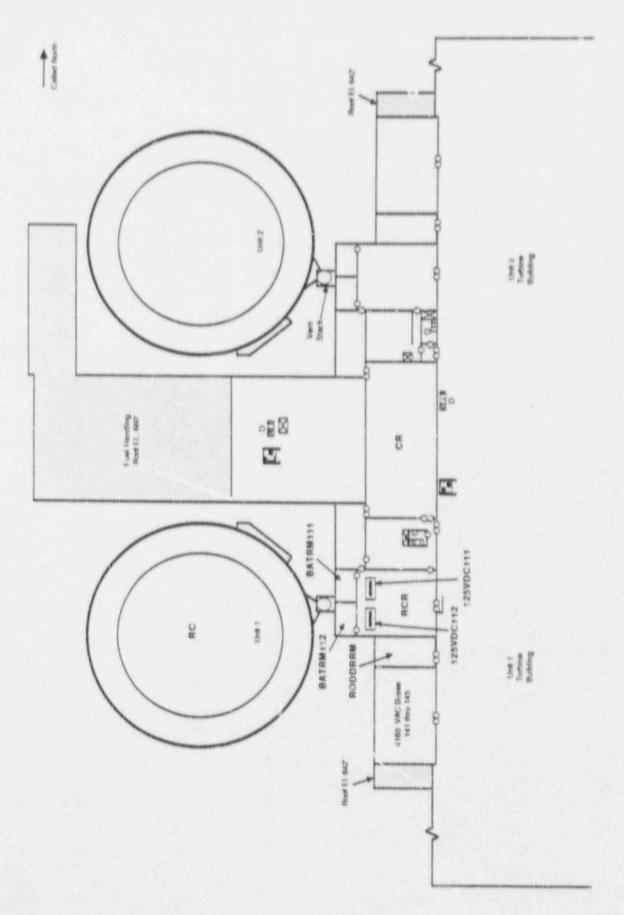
Zion 1 and 2 General Arrangement, Elevation 642"
